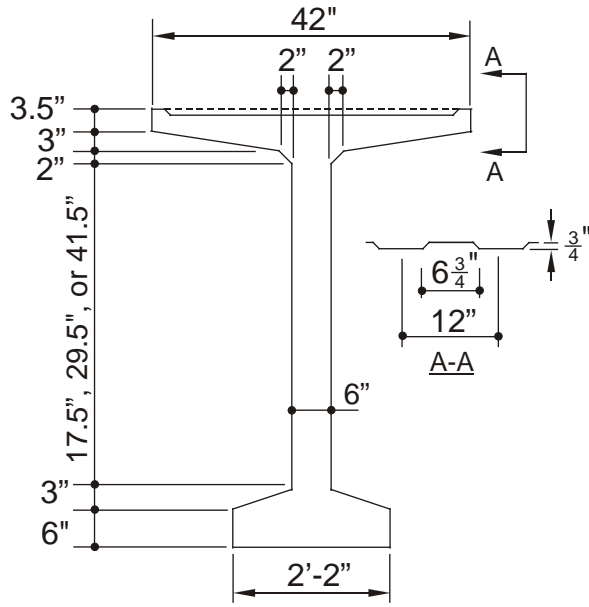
Proposed Girder: Stage 1 of Casting.
